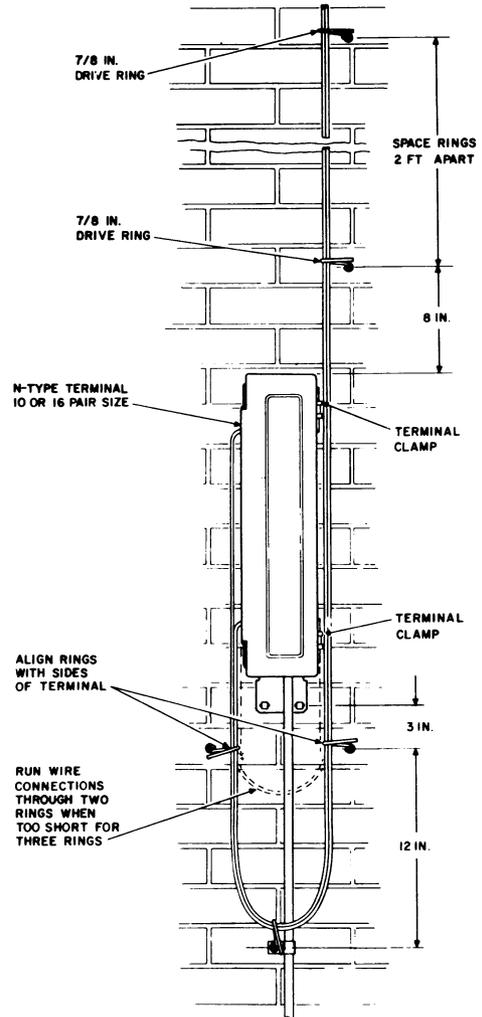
Wall-Mounted 10- or 16-Pair Cable Terminal With Stub at Bottom
